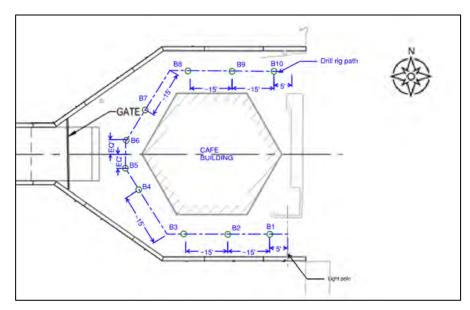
Plan View of Drill Rig Path and Borehole Locations
